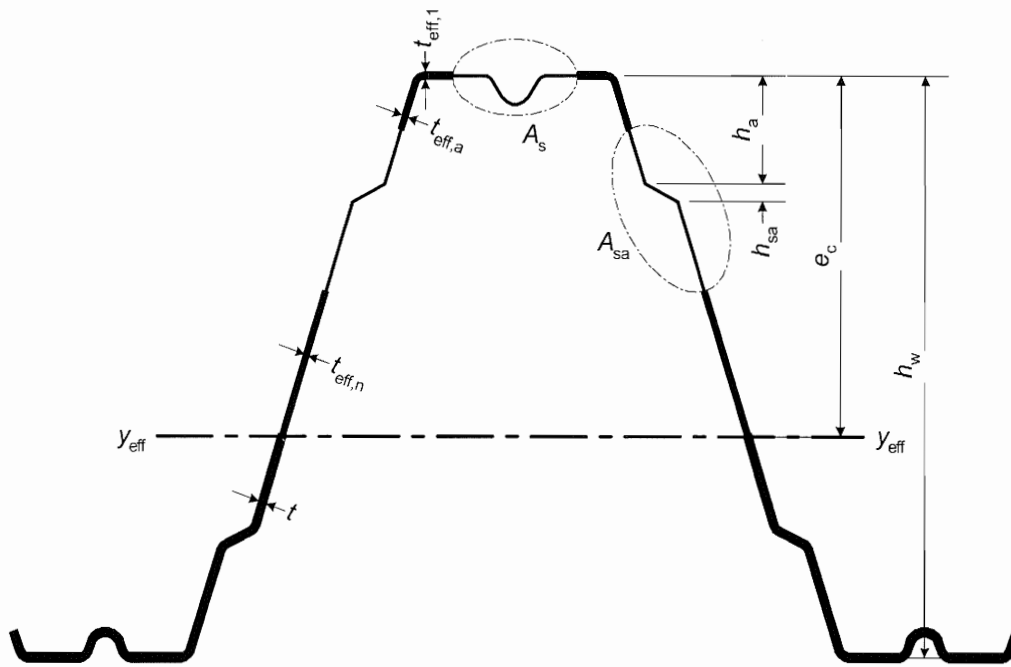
Effective cross section of cold-formed profiled sheeting with flange stiffeners and web stiffeners
